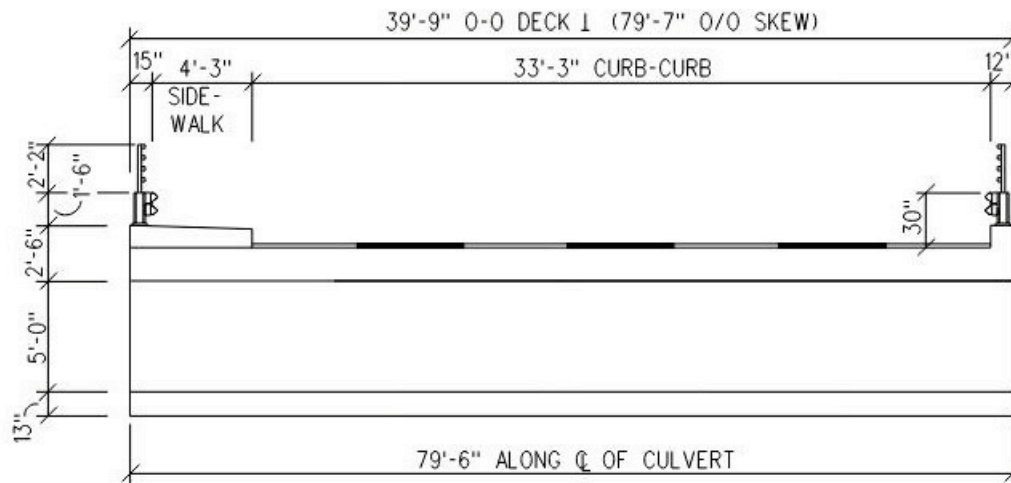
Existing typical section of County Road E 1/2 across Bridge MESA-E.5-29.8
